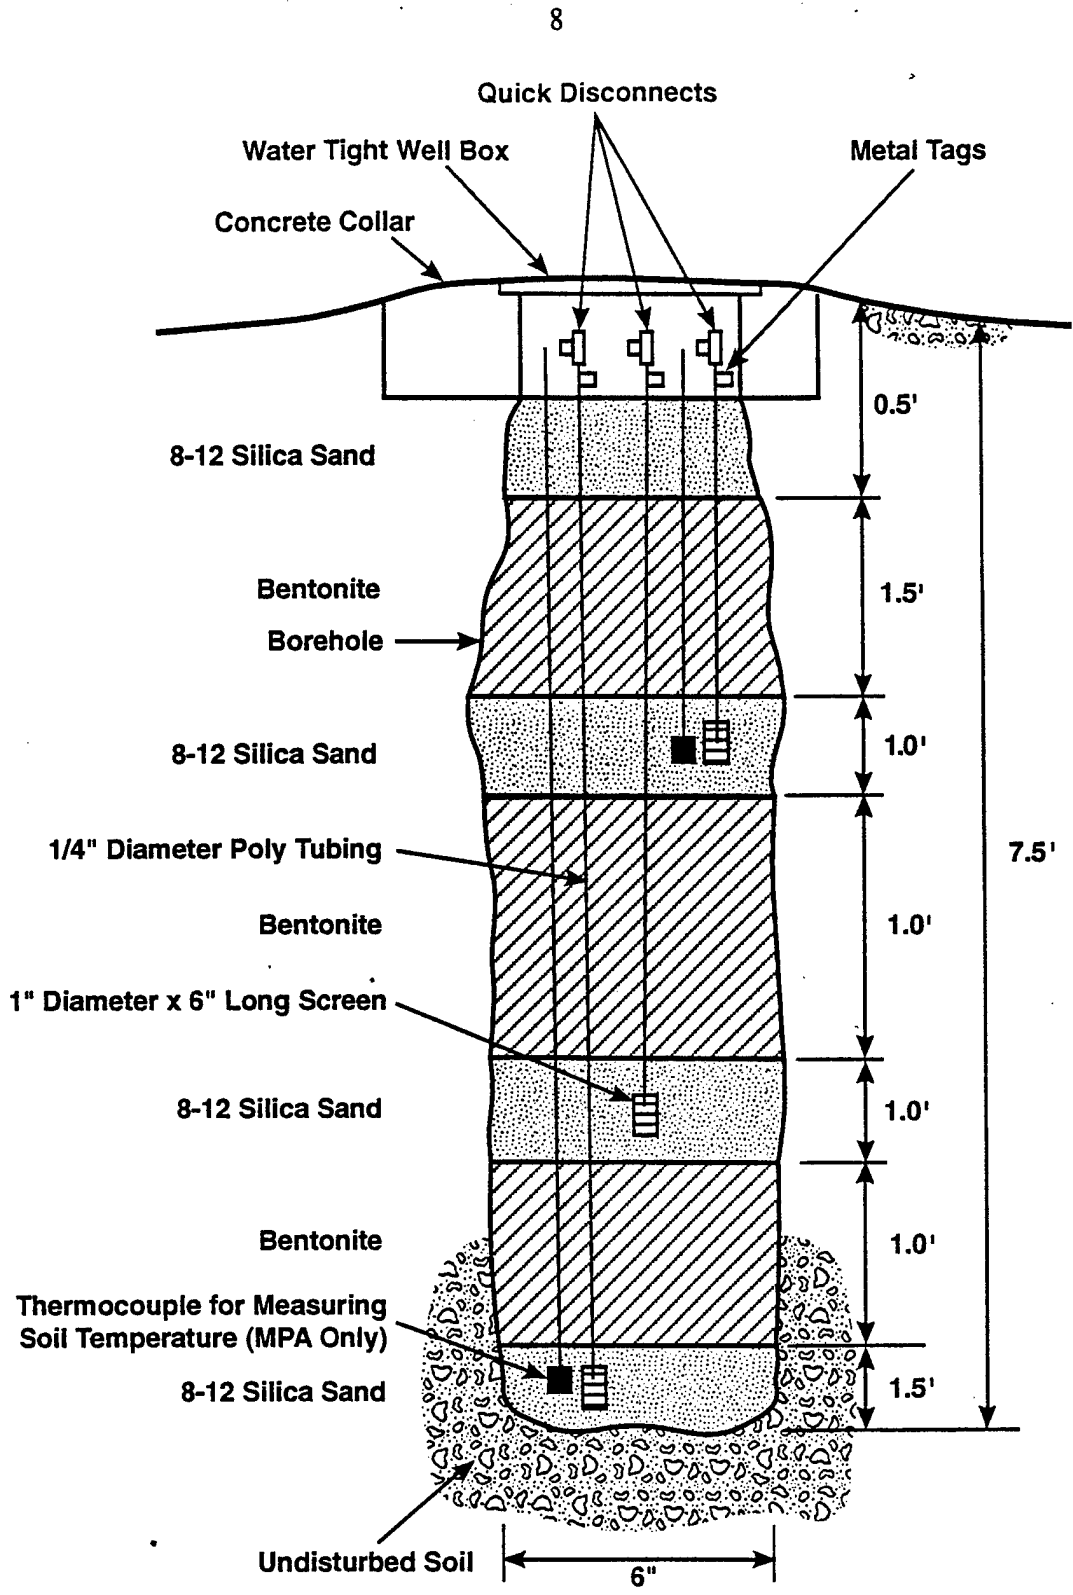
Schematic Diagram of a Typical Monitoring Point Construction at Site SS10
